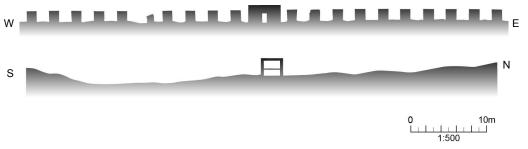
(Top): Section running W-E through pillbox and anti-tank blocks perpendicular to beach
